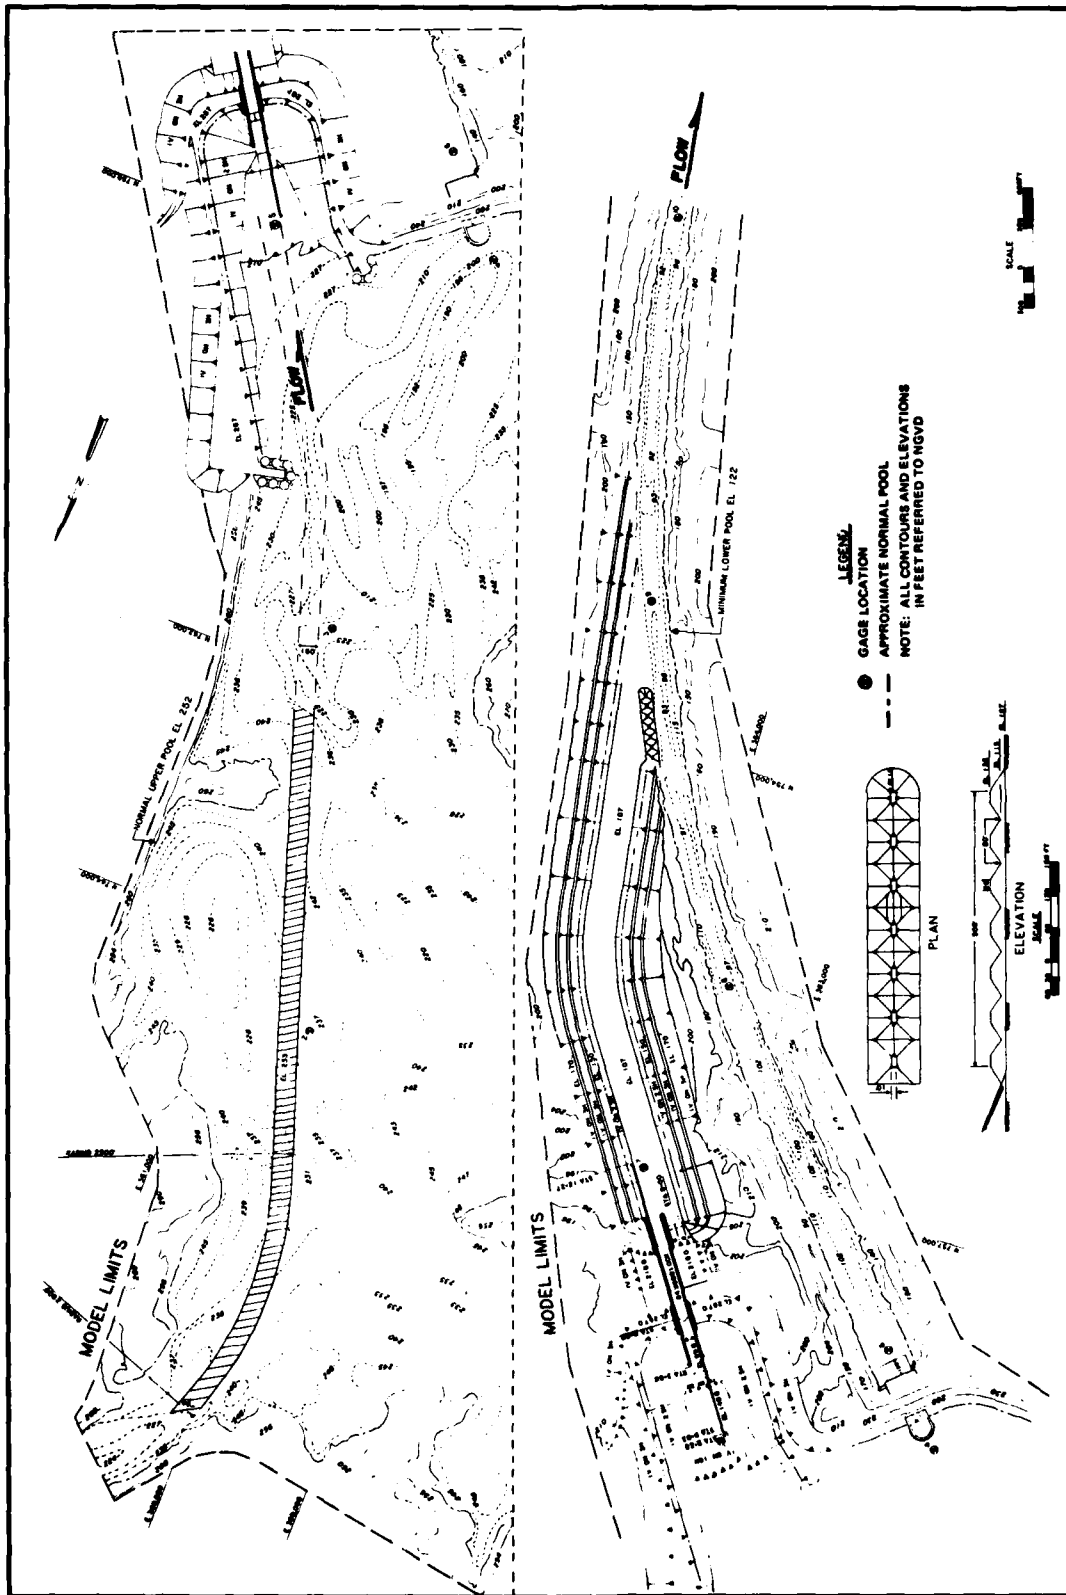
Boulder Lock and Dam, Model A, Plan A-2
